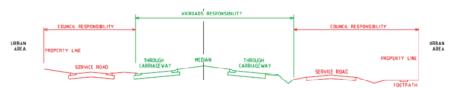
Demarcation Arrangements Urban Arterial Roads
